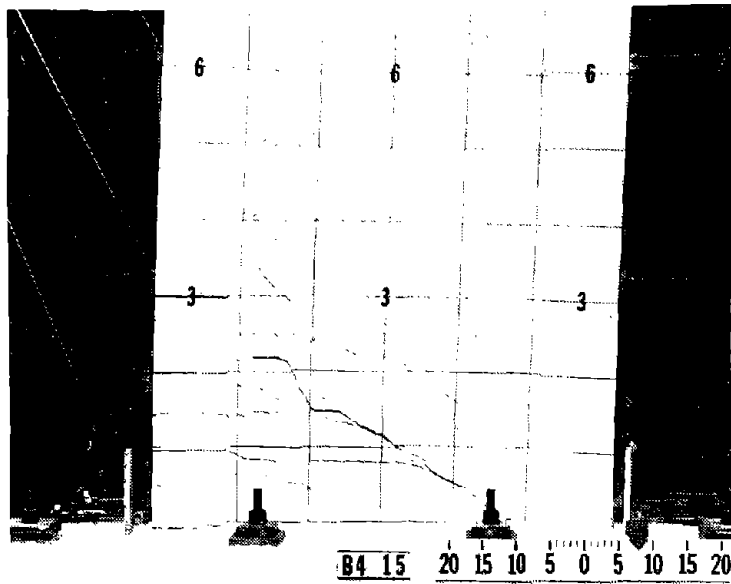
Cracking Pattern at +8 in. Deflection for Specimen B4
